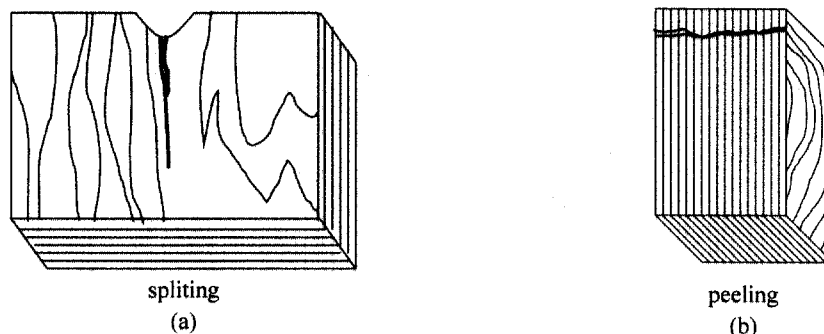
Failure mode of SCL in dowel bearing test. (a) loading parallel-to-grain (b) loading perpendicular-to-grain.
